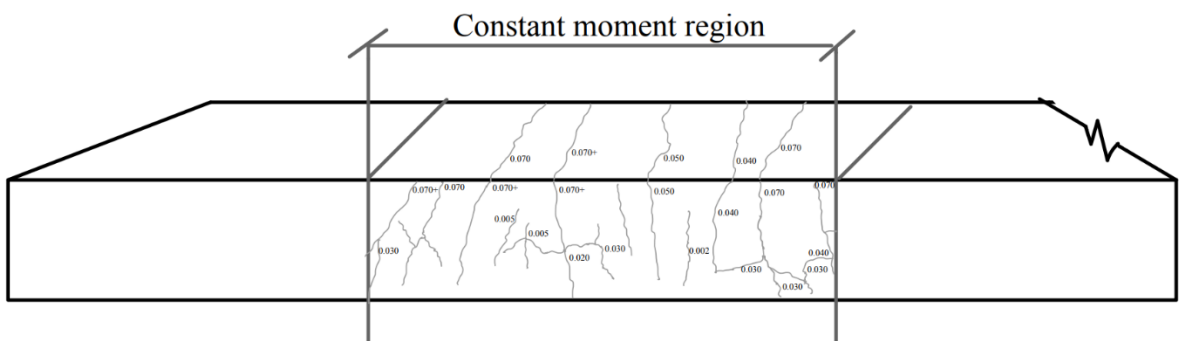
Crack Propagation for Monolithic Control Specimen at Failure
